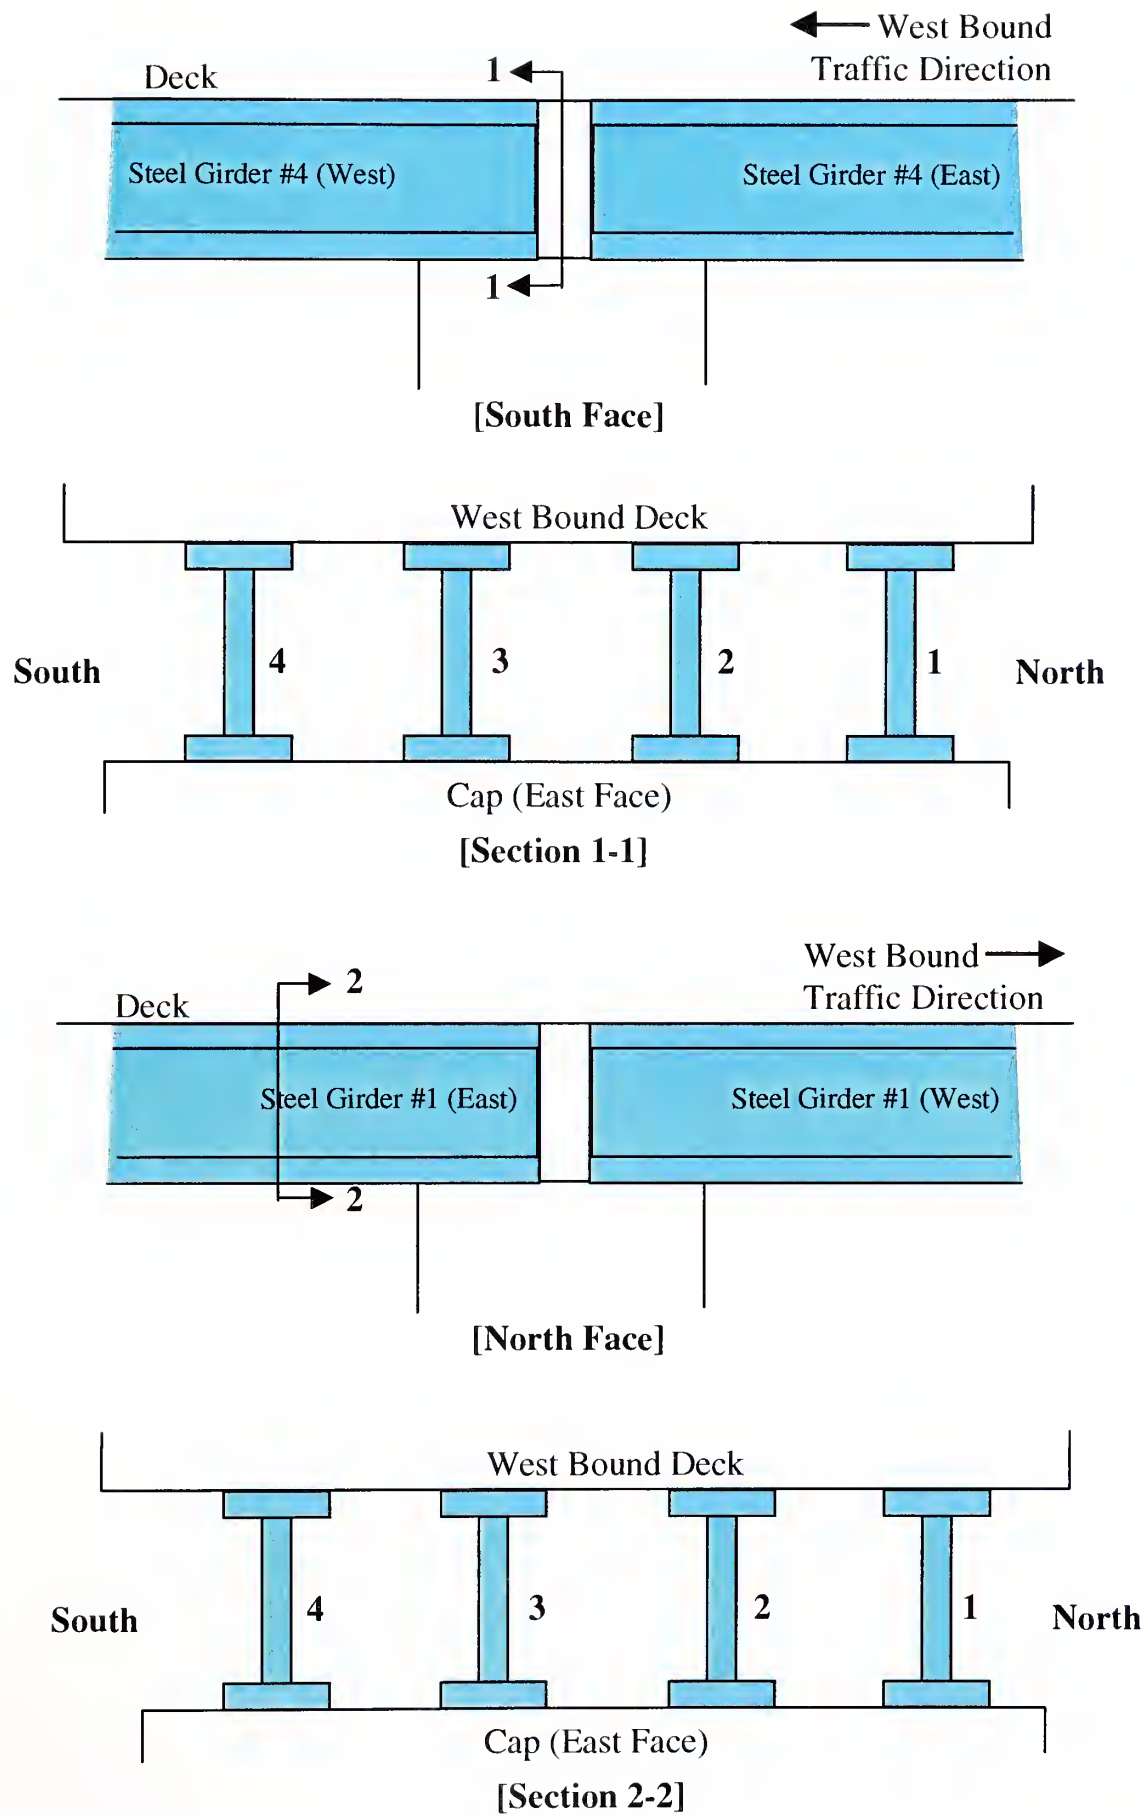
B. Condition of Girder Joints over Bent No. 10 (West Bound).
